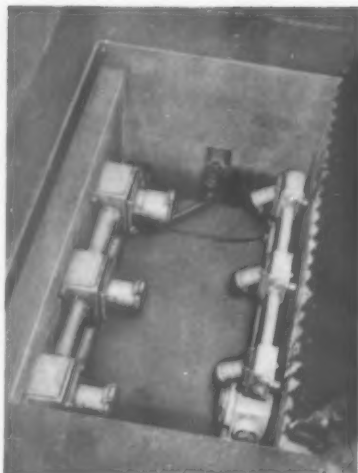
Explosion-proof receptacle in service pit of large airport. (Courtesy Russell & Stoll Co.)
